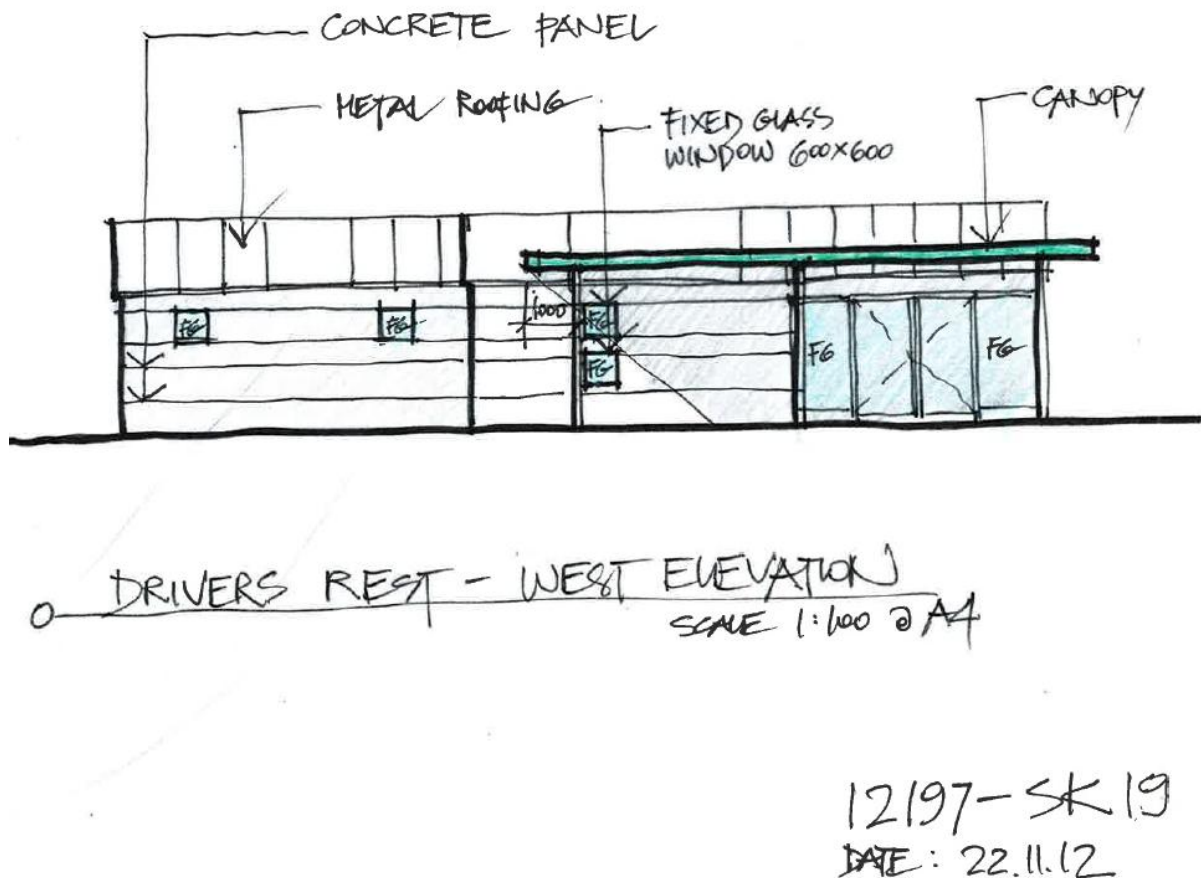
Revised Design, Western Facade, Drivers Rest Building
